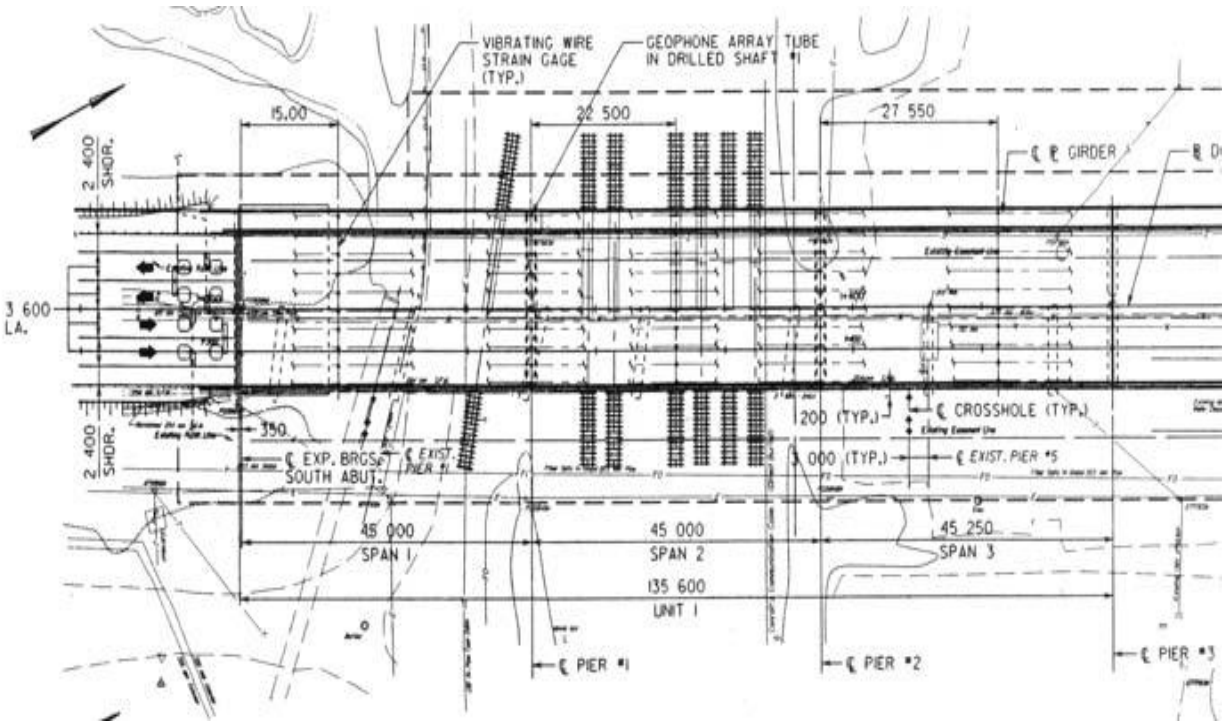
Plan view of the Doremus Avenue Bridge, unit 1, spans 1, 2, and 3.
